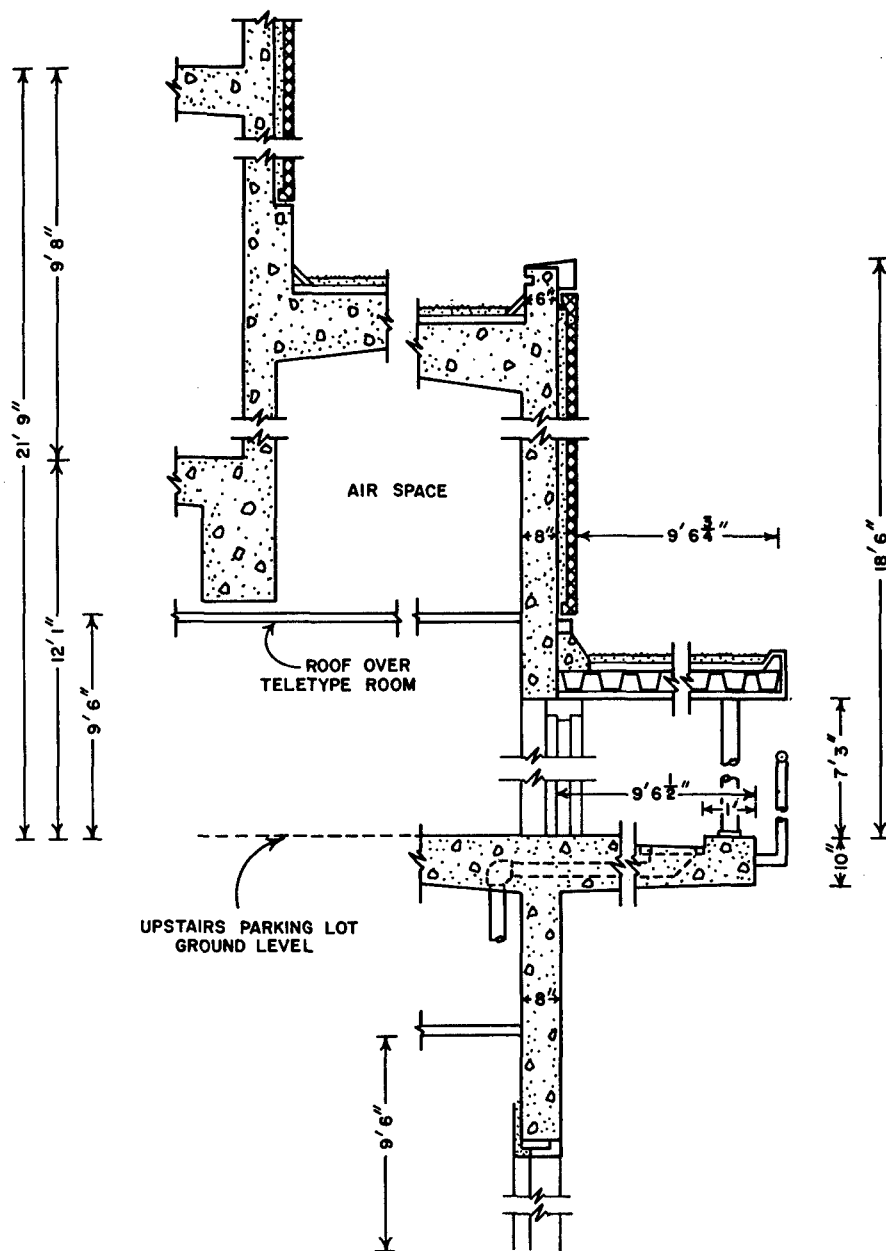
Typical east-wall section of Los Angeles Police Department building.
